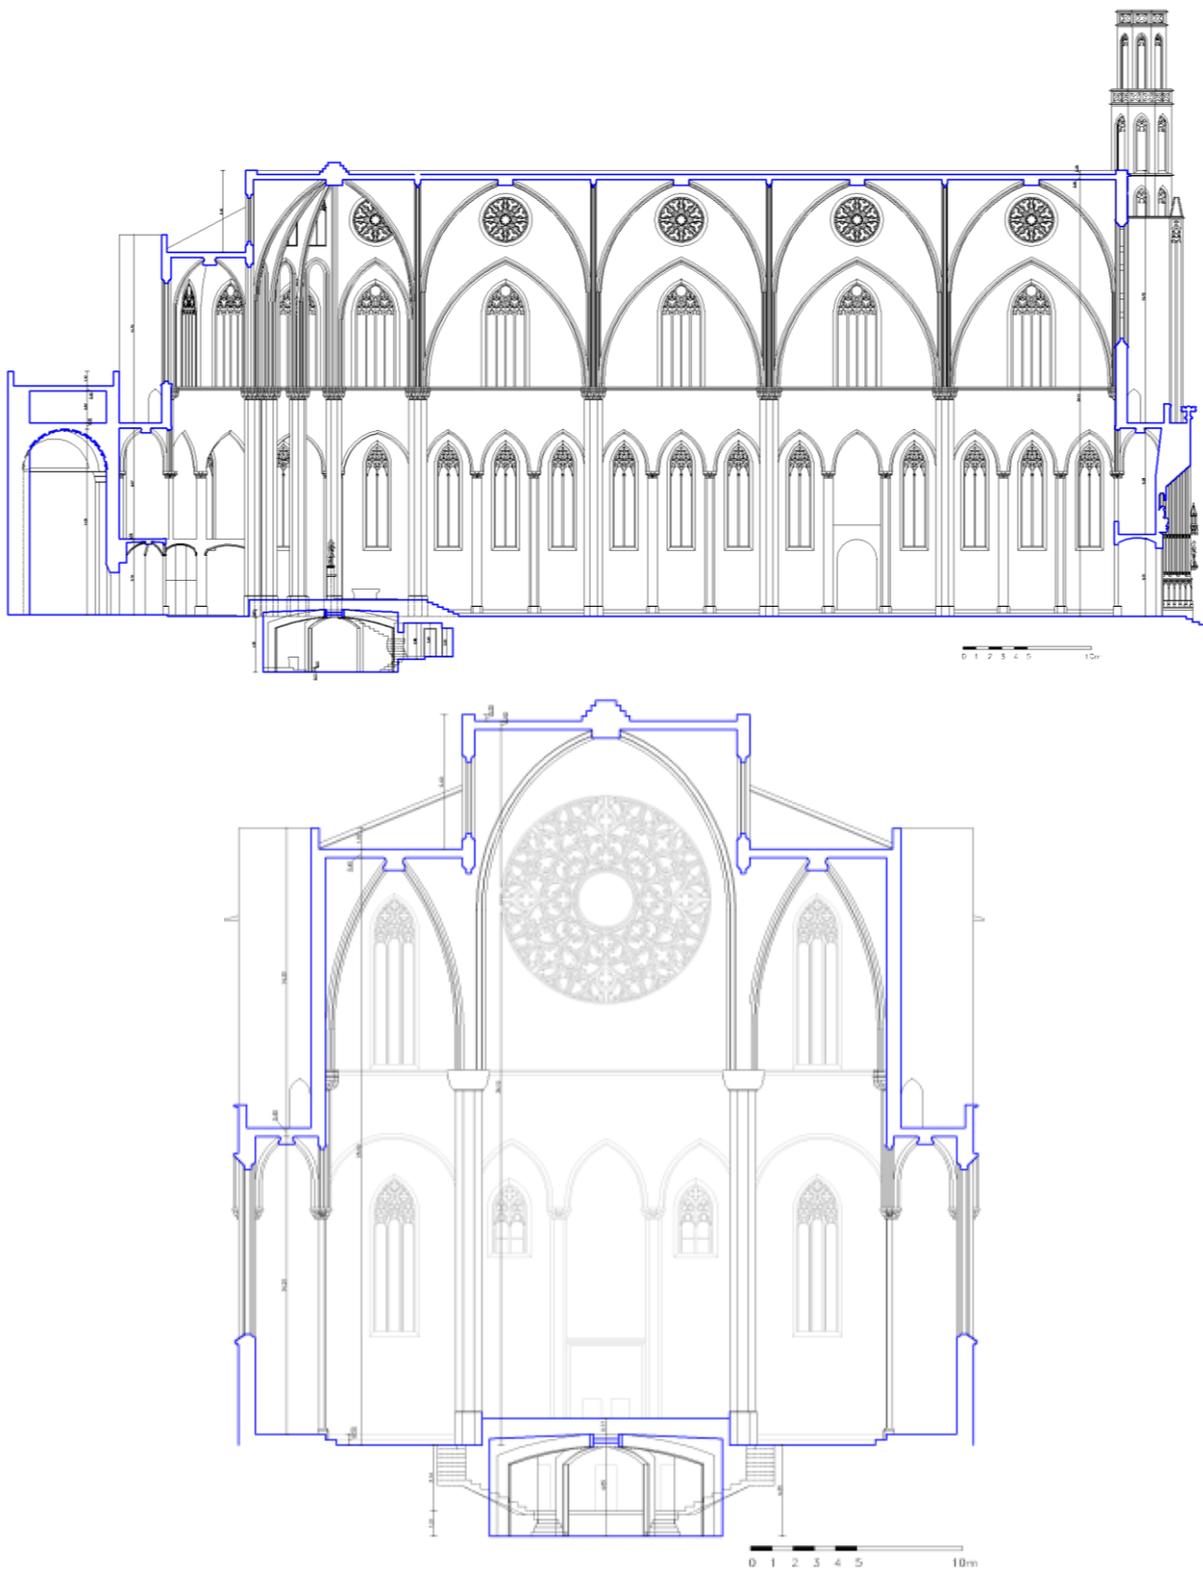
Architectural drawings of the SMM church (plans, Long. and Trans. sections).
